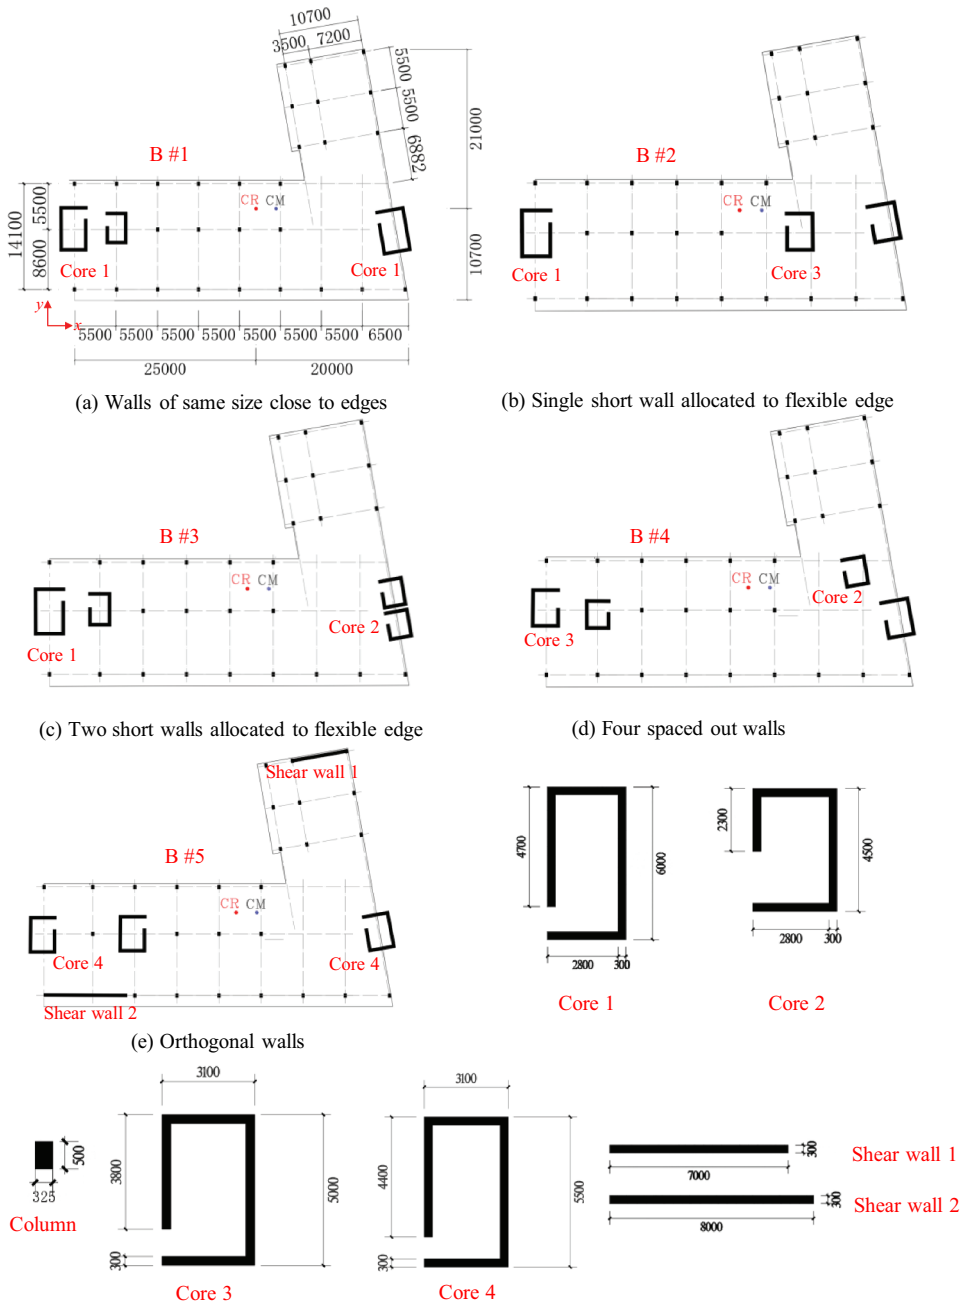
Plan configurations of the considered uni-directional asymmetric buildings.
